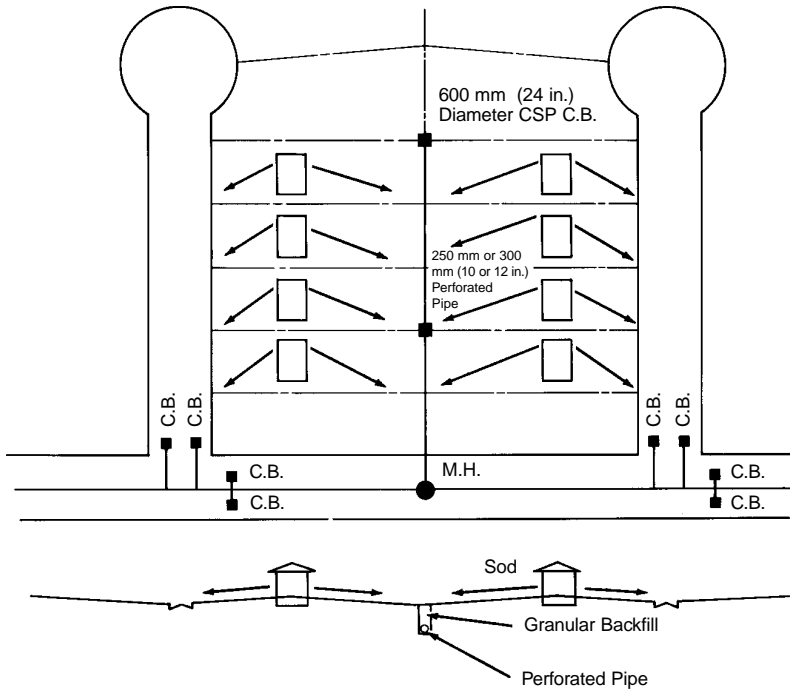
Typical plan for "underground disposal of stormwater runoff" for residential development.
